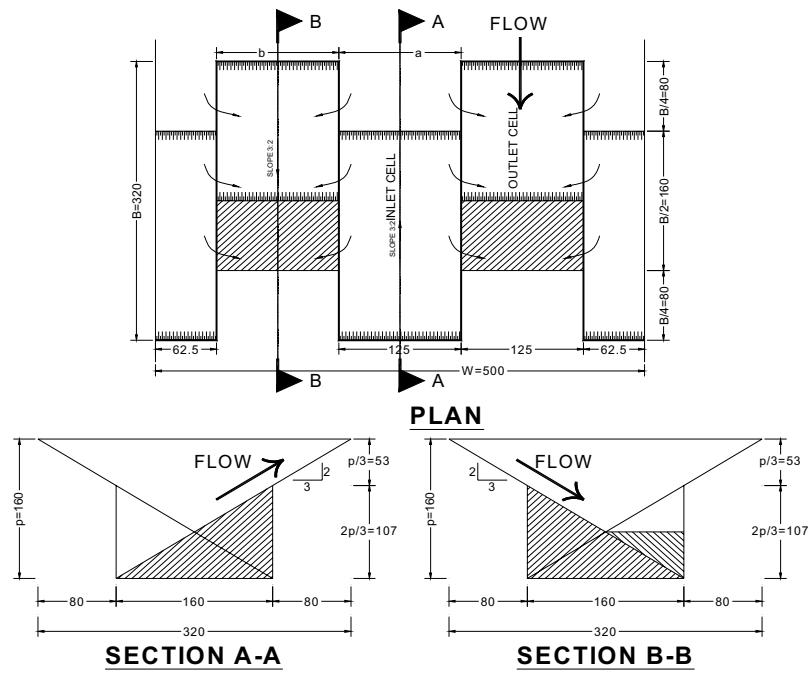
Plan and section of model P₂M₅ with filling outlet cell modification (dimensions in mm)
